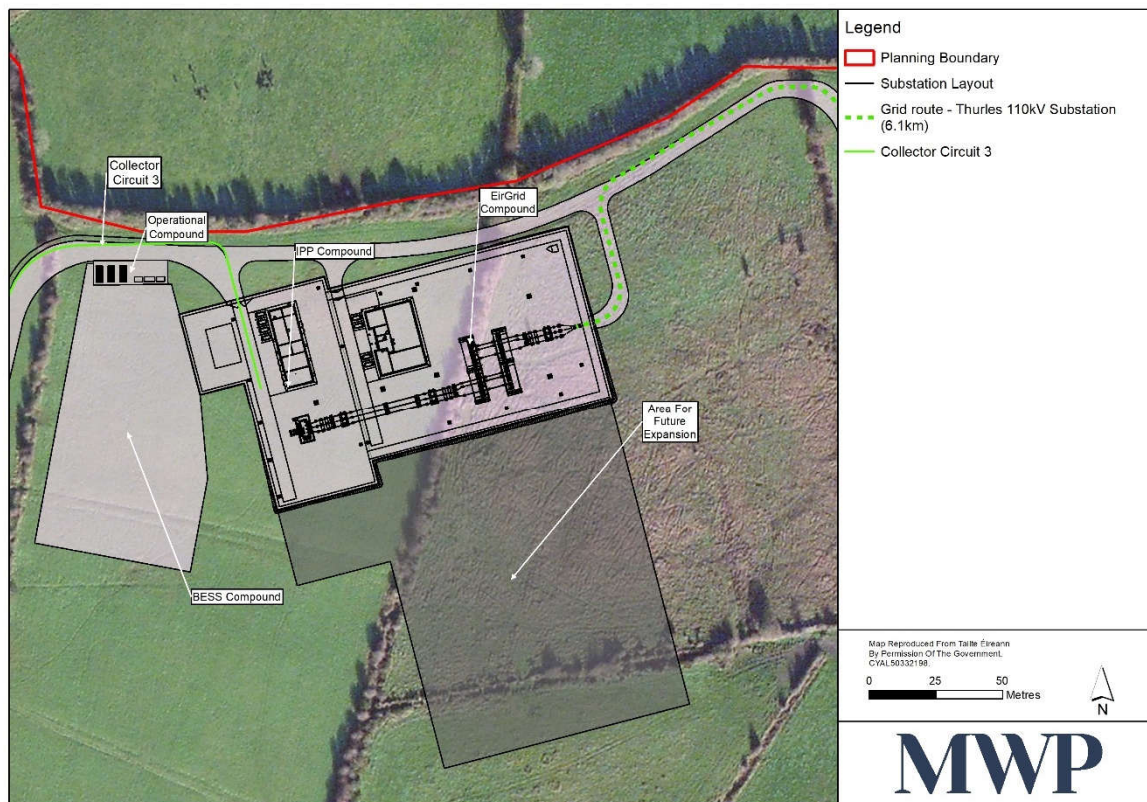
Proposed 110kV Substation compound location and Battery Energy Storage System – with future potential expansion area for EirGrid compound.
